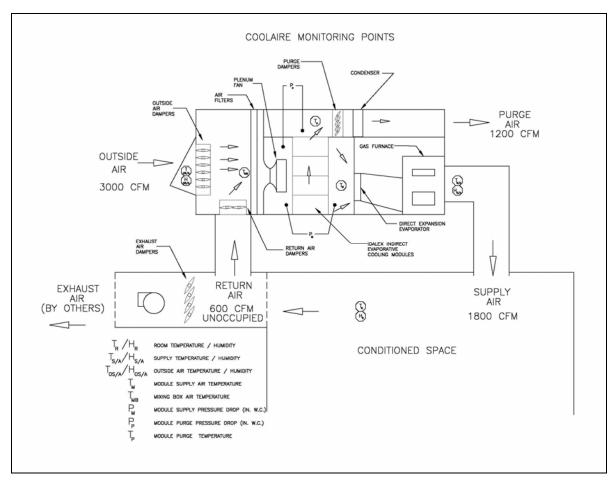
Schematic Cross-section of CoolAire Package Unit with Approximate Sensor Locations
